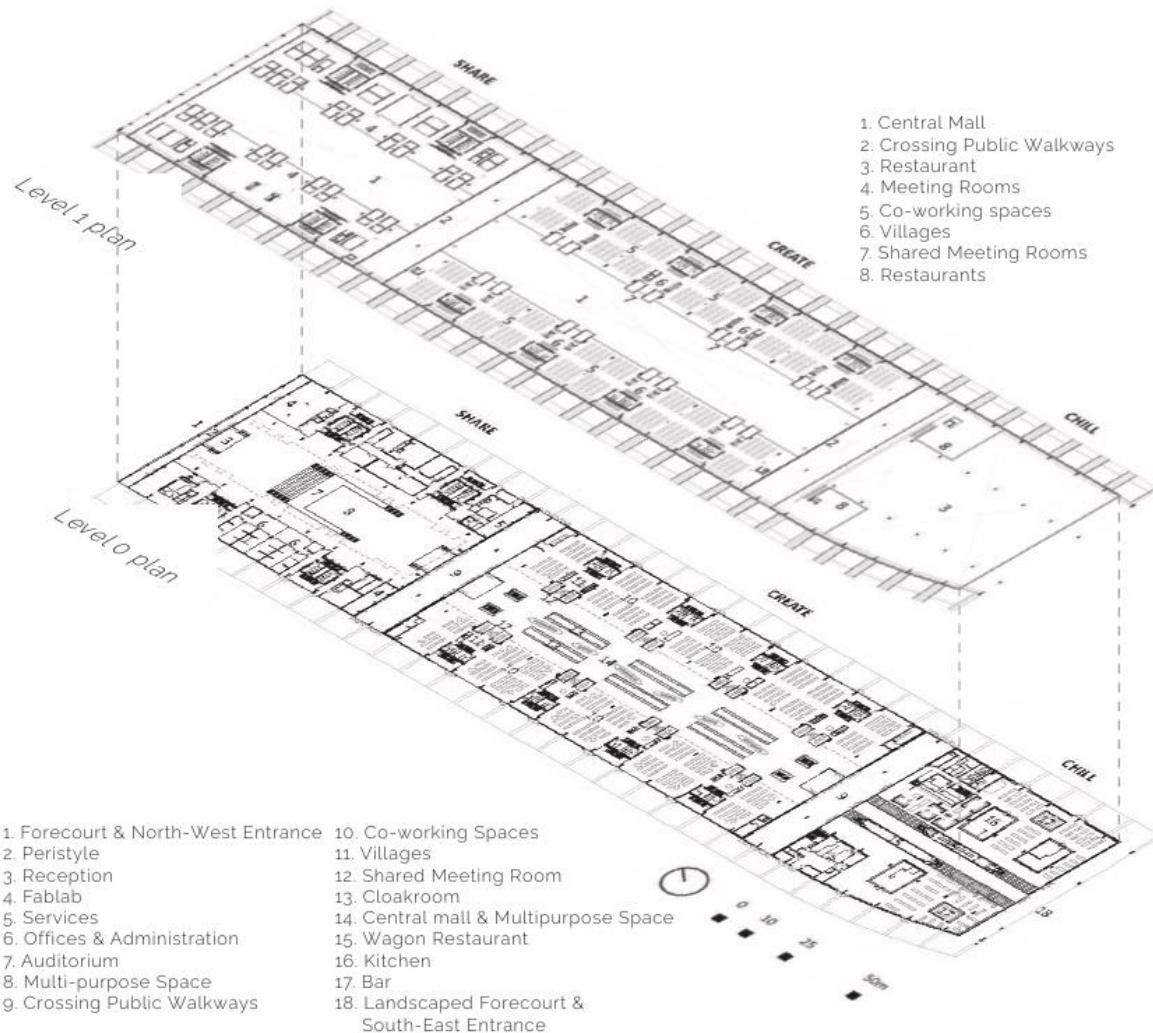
Station F -Floor Plans (ArchDaily) (Author)
